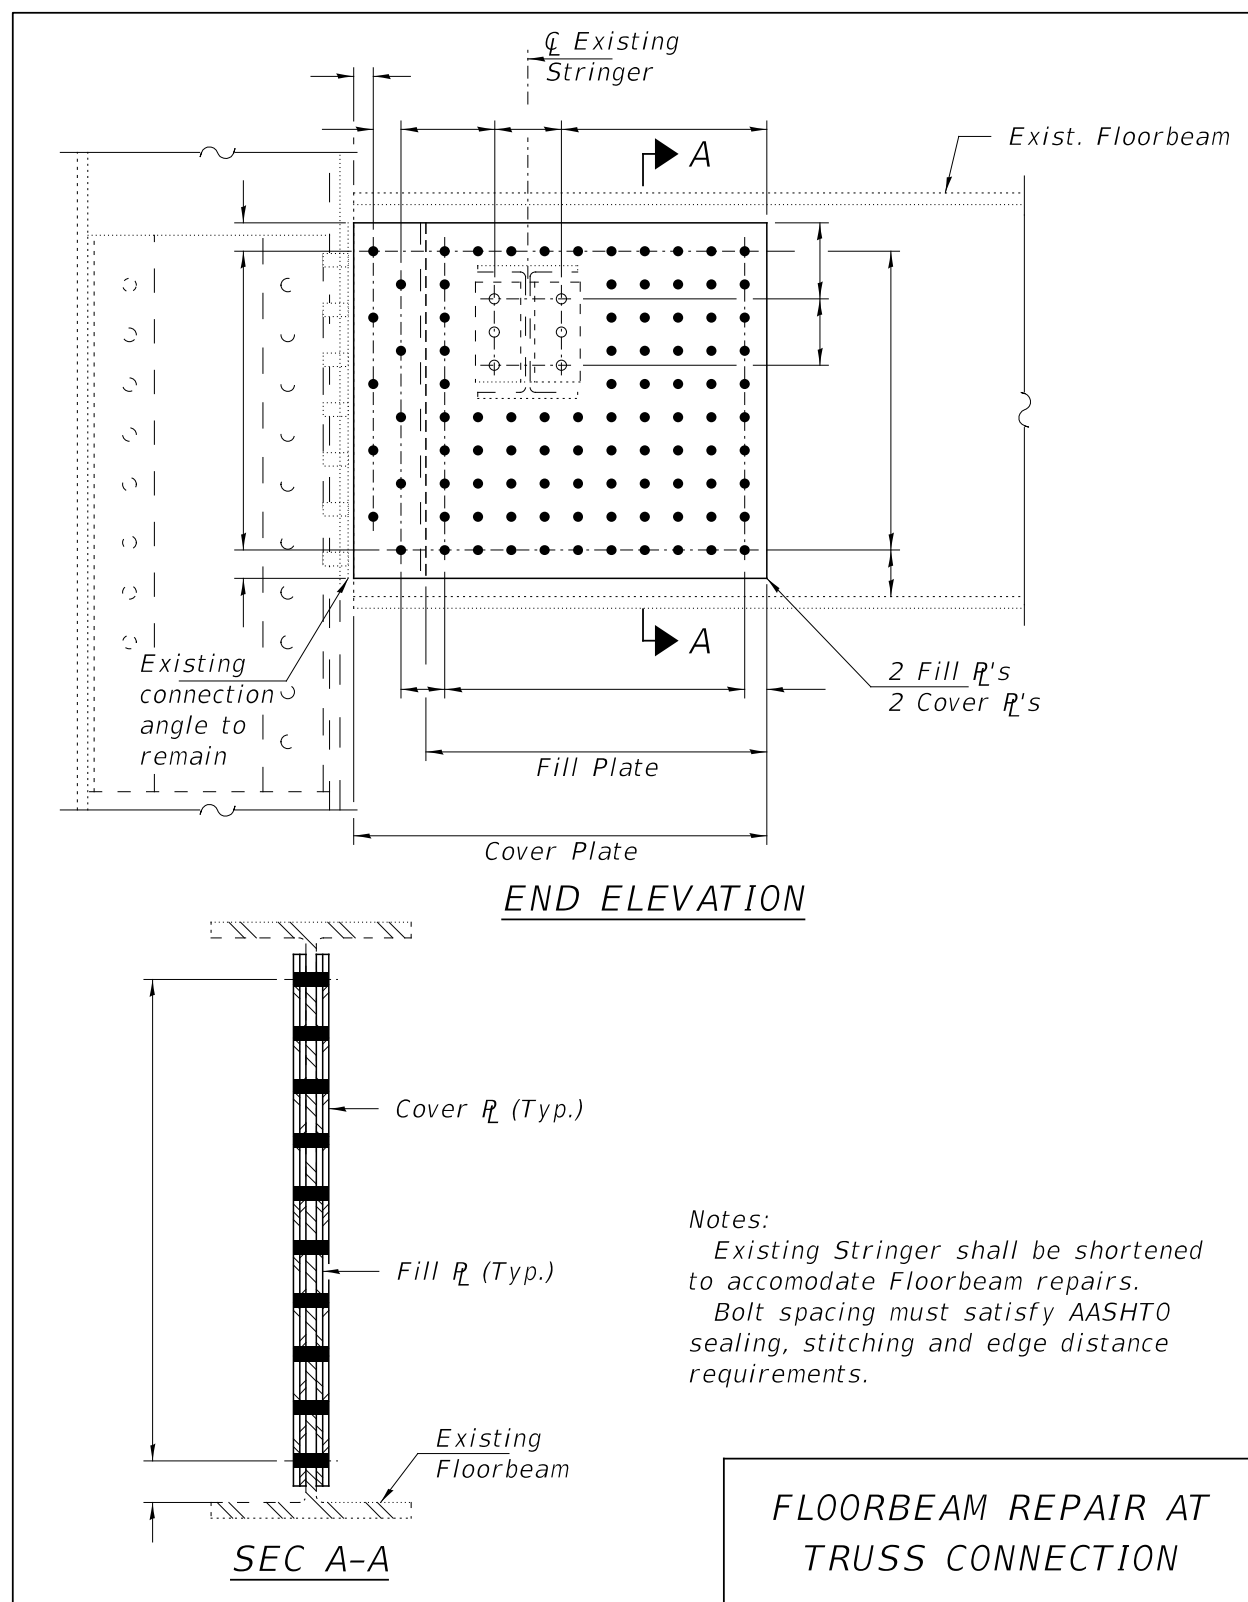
Floorbeam Repair at Truss Connection
